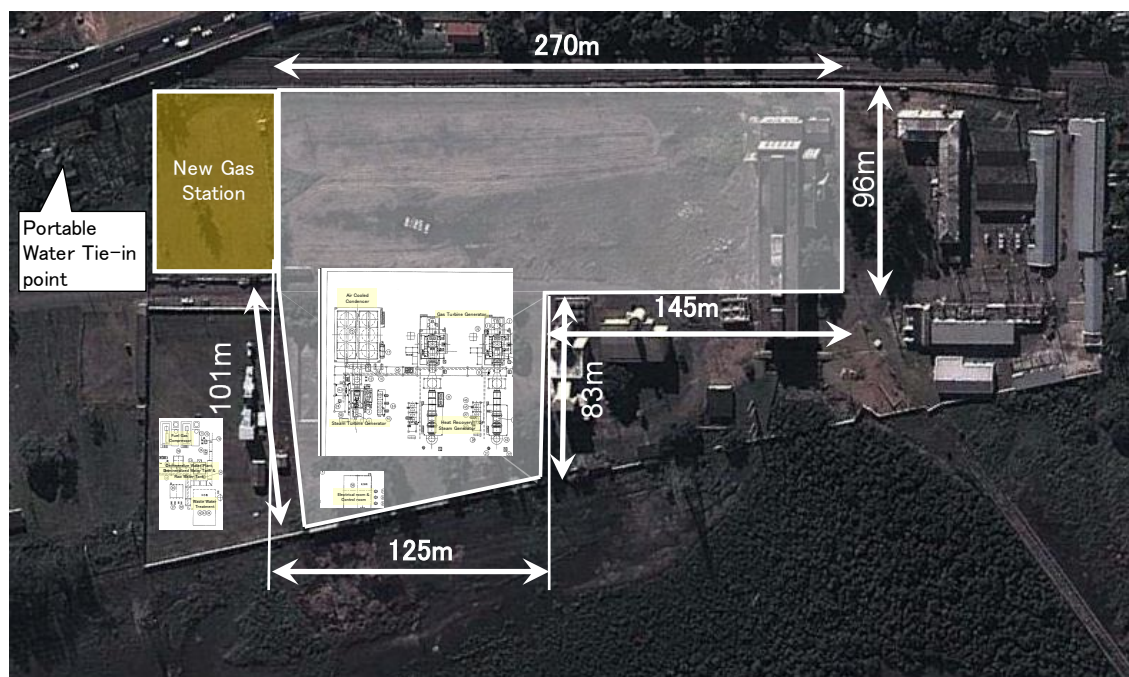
Typical CCGT Layout of an aero-derivative GT
